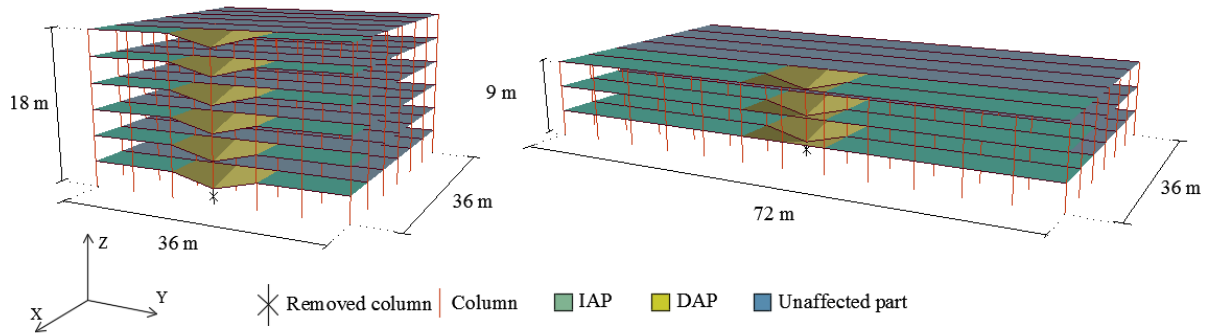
Overview of the illustrative cases: Building 1 subjected to the notional removal of an edge column (left) and Building 2 subjected to the notional removal of an internal column (right)
